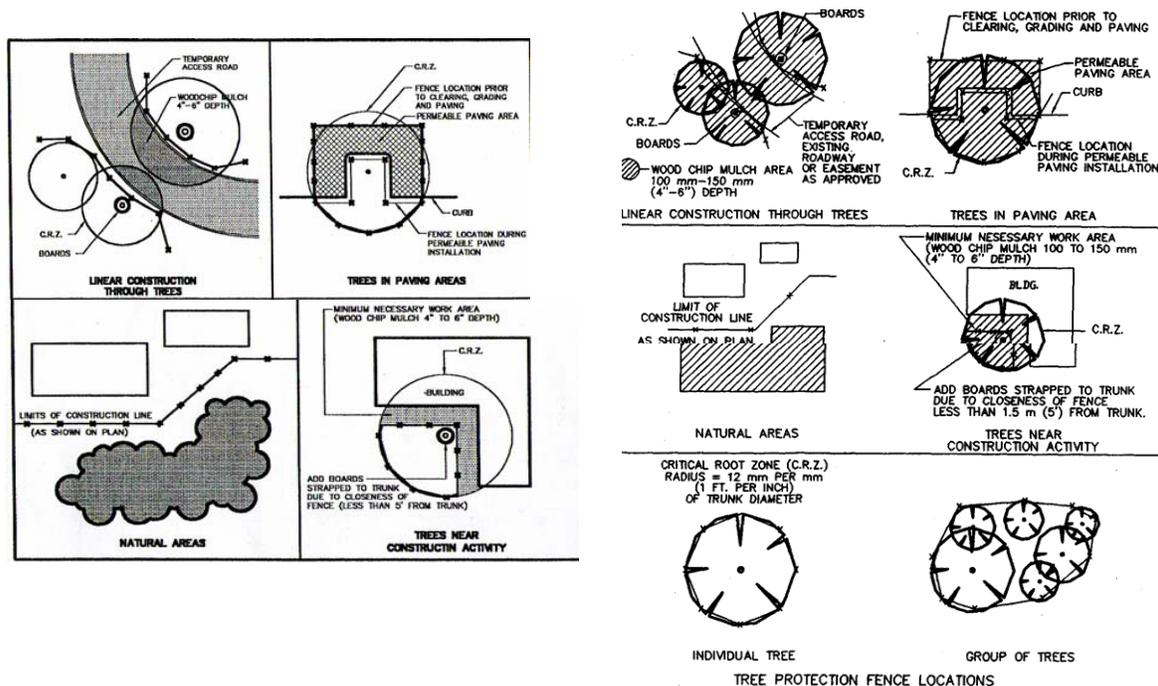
Examples of tree protection fencing surrounding the Critical Root Zone—Wood fencing, without and with adjacent obstruction
